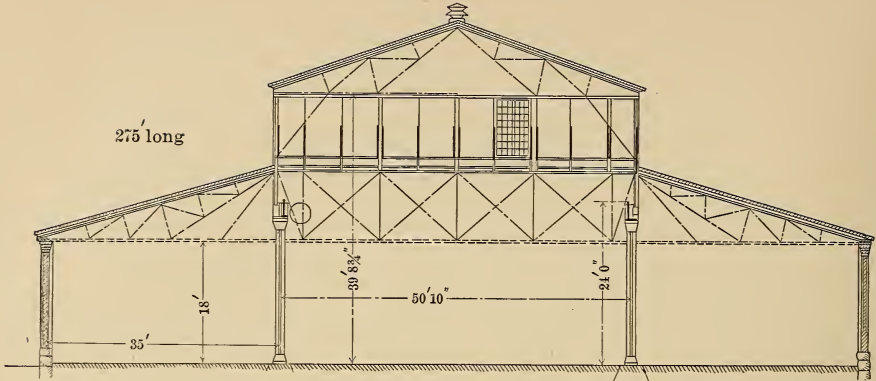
SECTION OF BOILER SHOP OF THE PITTSBURGH LOCOMOTIVE WORKS. PITTSBURGH, PA
